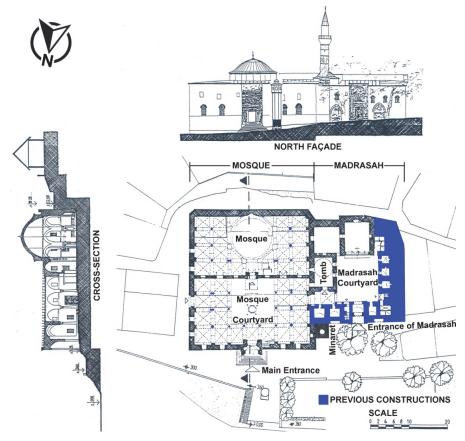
Plan, Cross-section and Façade of the Manisa Grand Mosque Complex (D.E.U., 1996)
